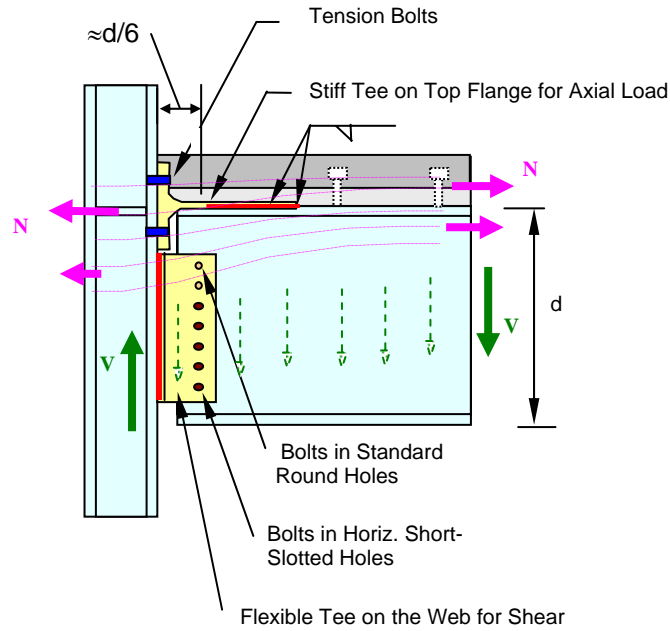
Welded-Bolted and Bolted-Bolted Tee Shear Connections
